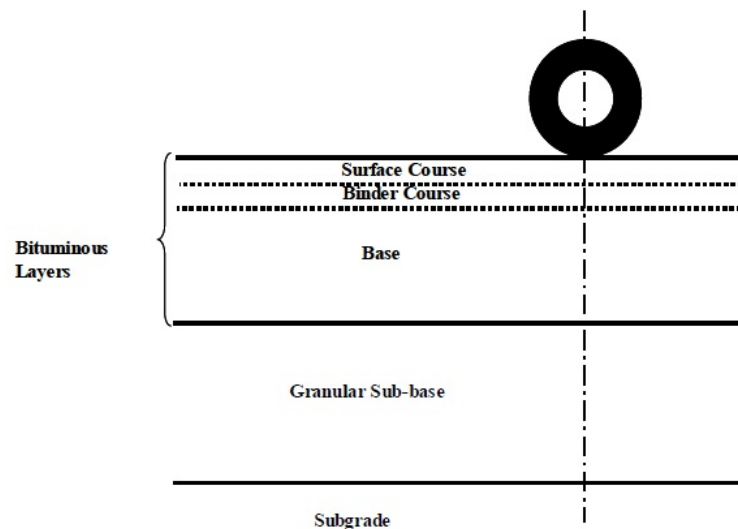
A Typical Flexible Pavement (Taherkhani, 2006)
